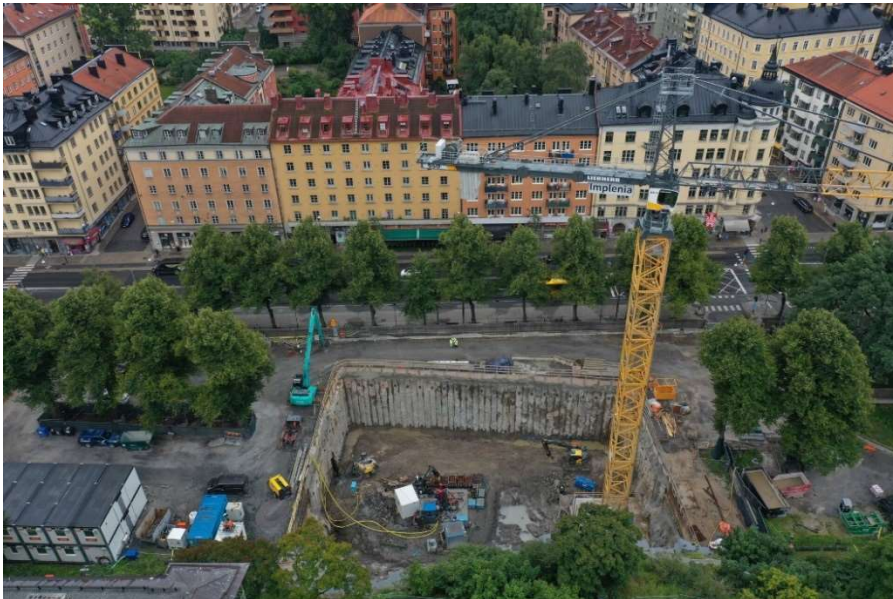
Picture showing time for installation of anchor level 2 as well as ongoing raise boring for the elevator shaft.
